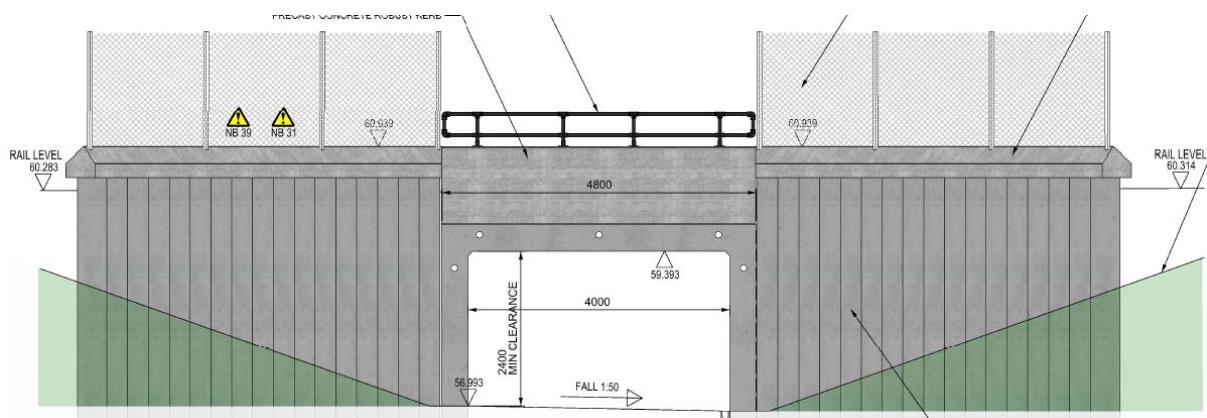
Elevation of proposed underpass. (Source: drawing 60601435-ACM-01-ZZ-DRG-EST-001102)
